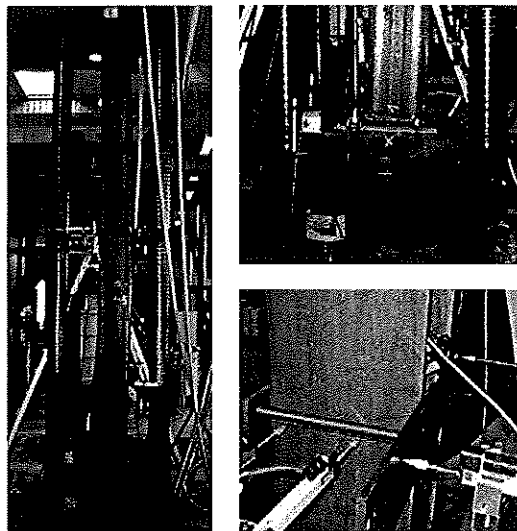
General view of test set-up - support conditions and instrumentation in the mid-height cross-section and at supports.
